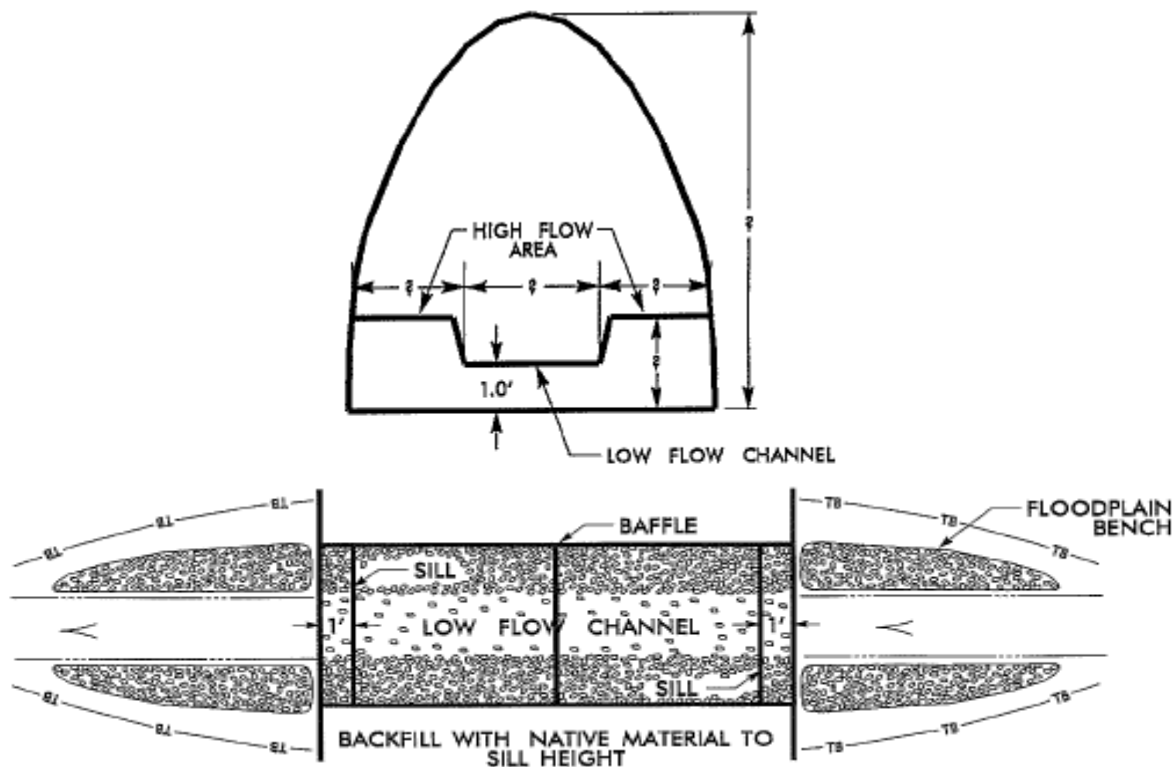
Sill with Notch on Wide Single Span Culvert with Floodplain Bench
